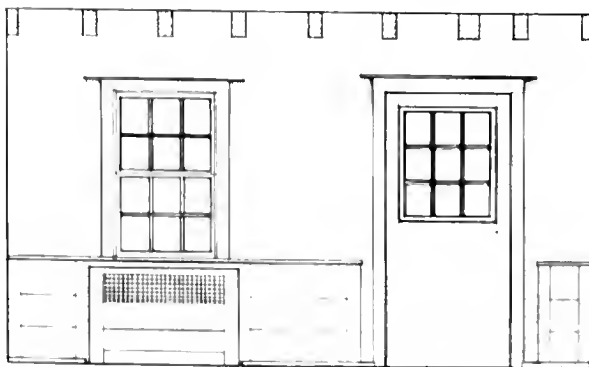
Dining Room, West Elevation. This elevation incorporates horizontal banded board wainscoting with plaster above which is typical throughout the MacFarlan home. The exposed joints are apparent in this elevation. The plaster wraps around the joints and above the window head.
